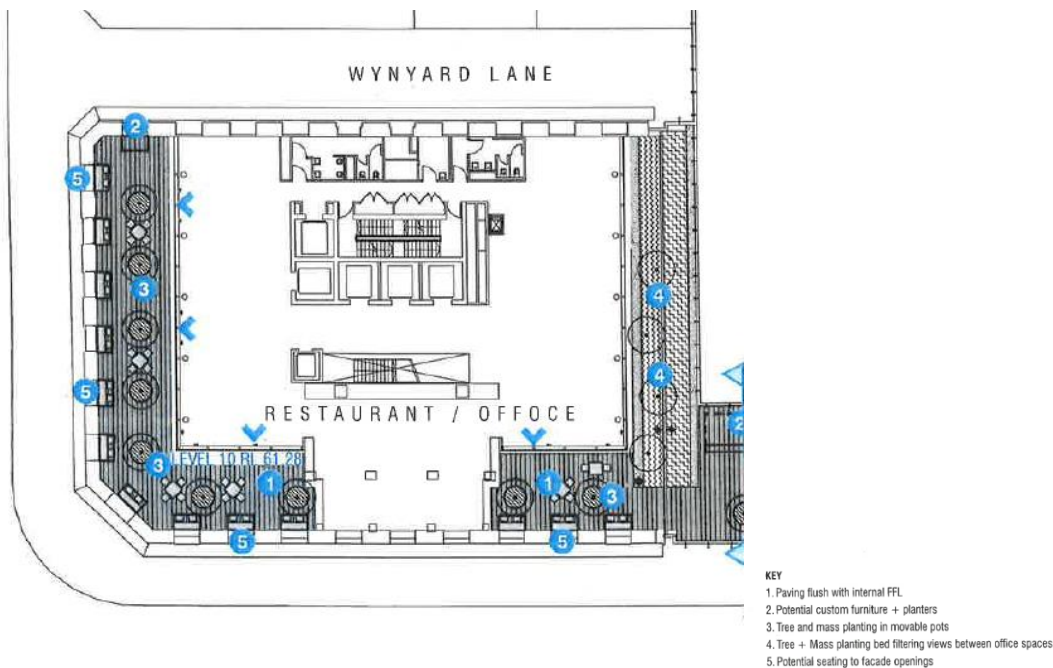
Approved landscape plan for terrace level 09 (Source: SSD 5824 Mod 4)
